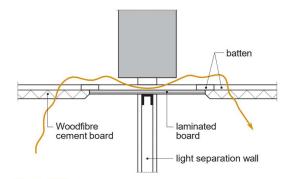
Circulation noise at the connection between a light partitioning wall and a ceiling and concrete beam
